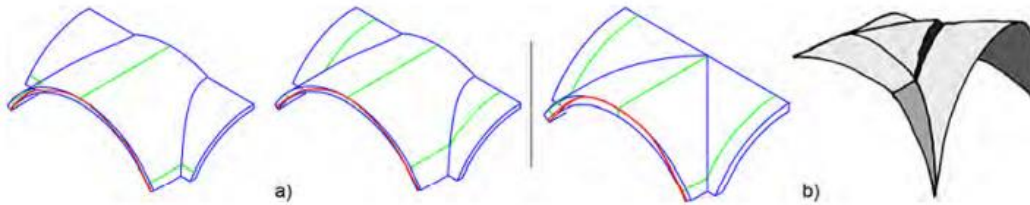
Collapse mechanisms (Holzer, 2011): (a) barrel vaults with lunettes and (b) failure mechanism for cross vaults.
